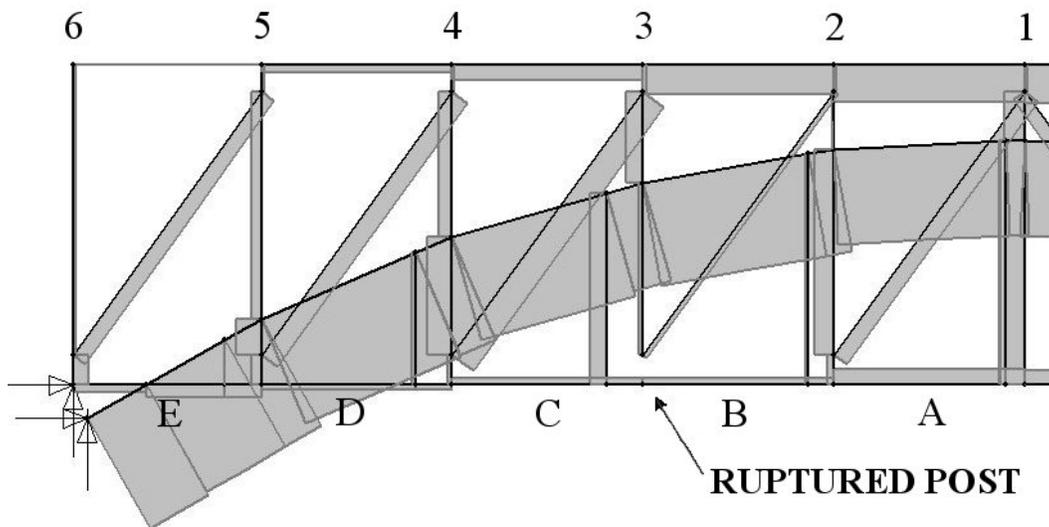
Axial Forces in Damaged Arch-Truss with Steel Ties due to Dead Load plus Mid-Span Live Load.
